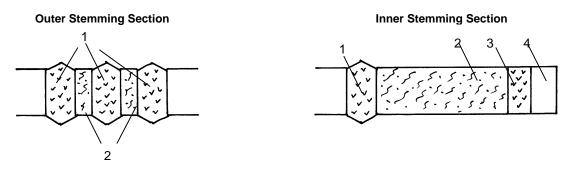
Stemming Sections. Stemming complex plan: 1- concrete keys; 2-crushed rock stemming; 3- individually-concreted sections; 4- explosion chamber. The length of concrete keys along the tunnel is nominally 3 meters, and the length of the individually concreted sections is nominally 1- to 2.5 meters, but these vary with the yield and rock mass conditions.
